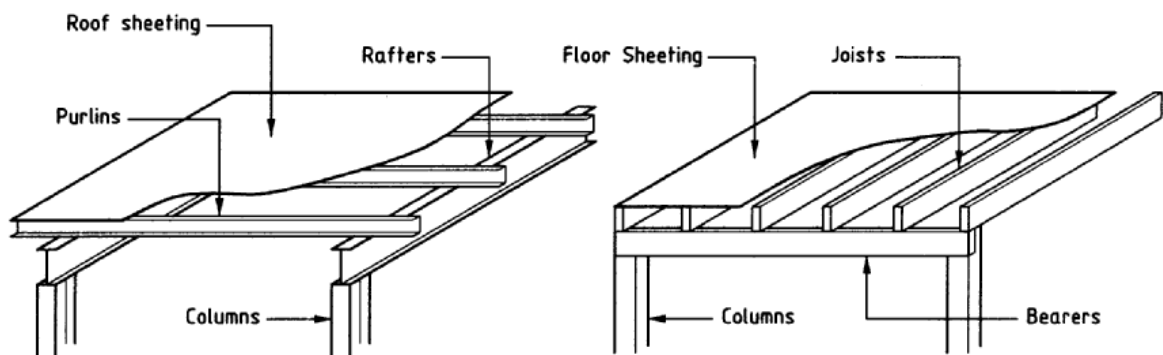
Similarity in Principle Between Floor and Roof Construction
